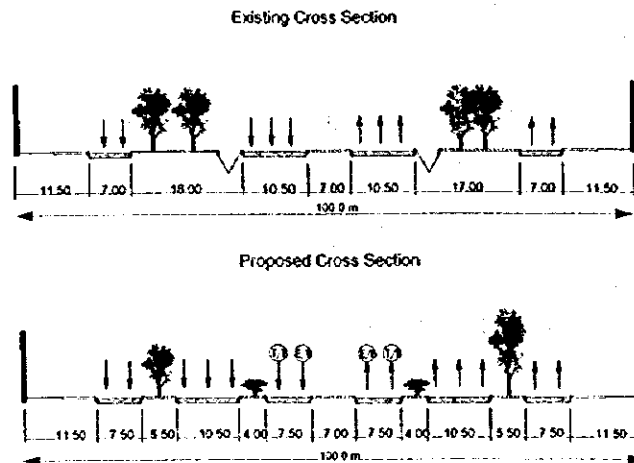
Typical Cross Section on Autopista Norte (3)
